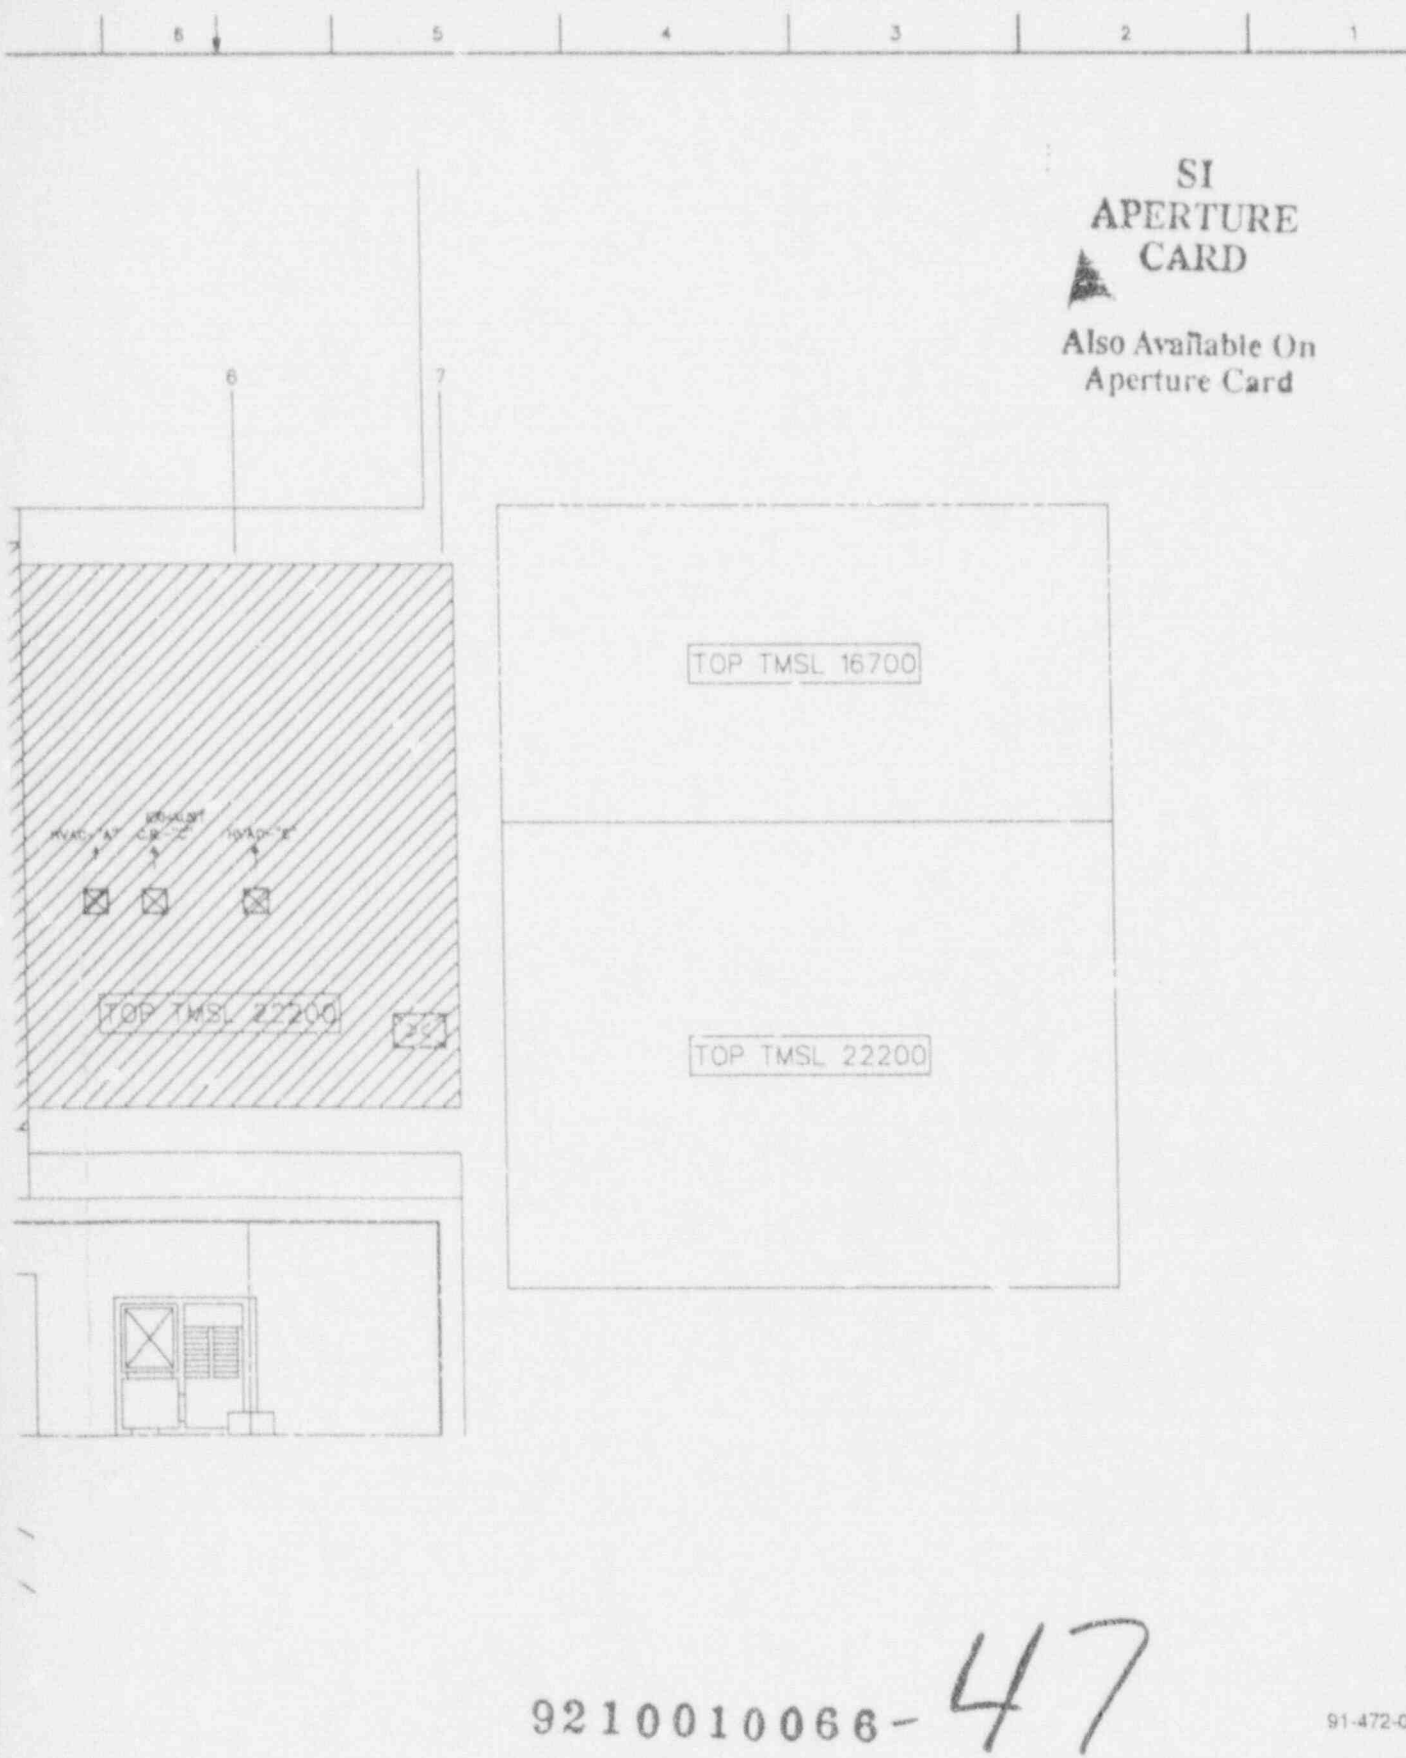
A.4-16B CONTROL BUILDING FIRE PROTECTION AT ELEVATION 22200mm
